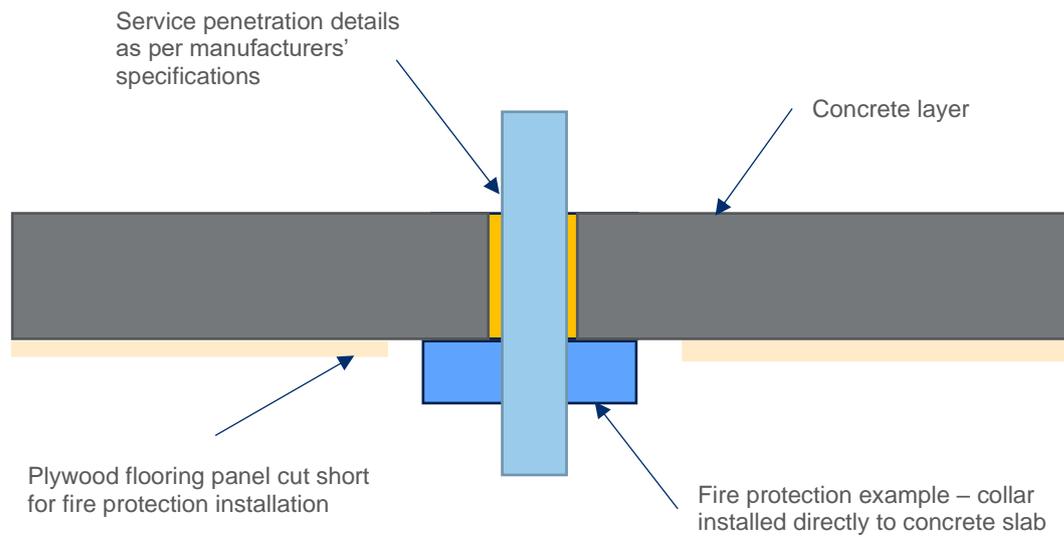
Service penetration of ATC floor systems with plywood (form) floor panel
